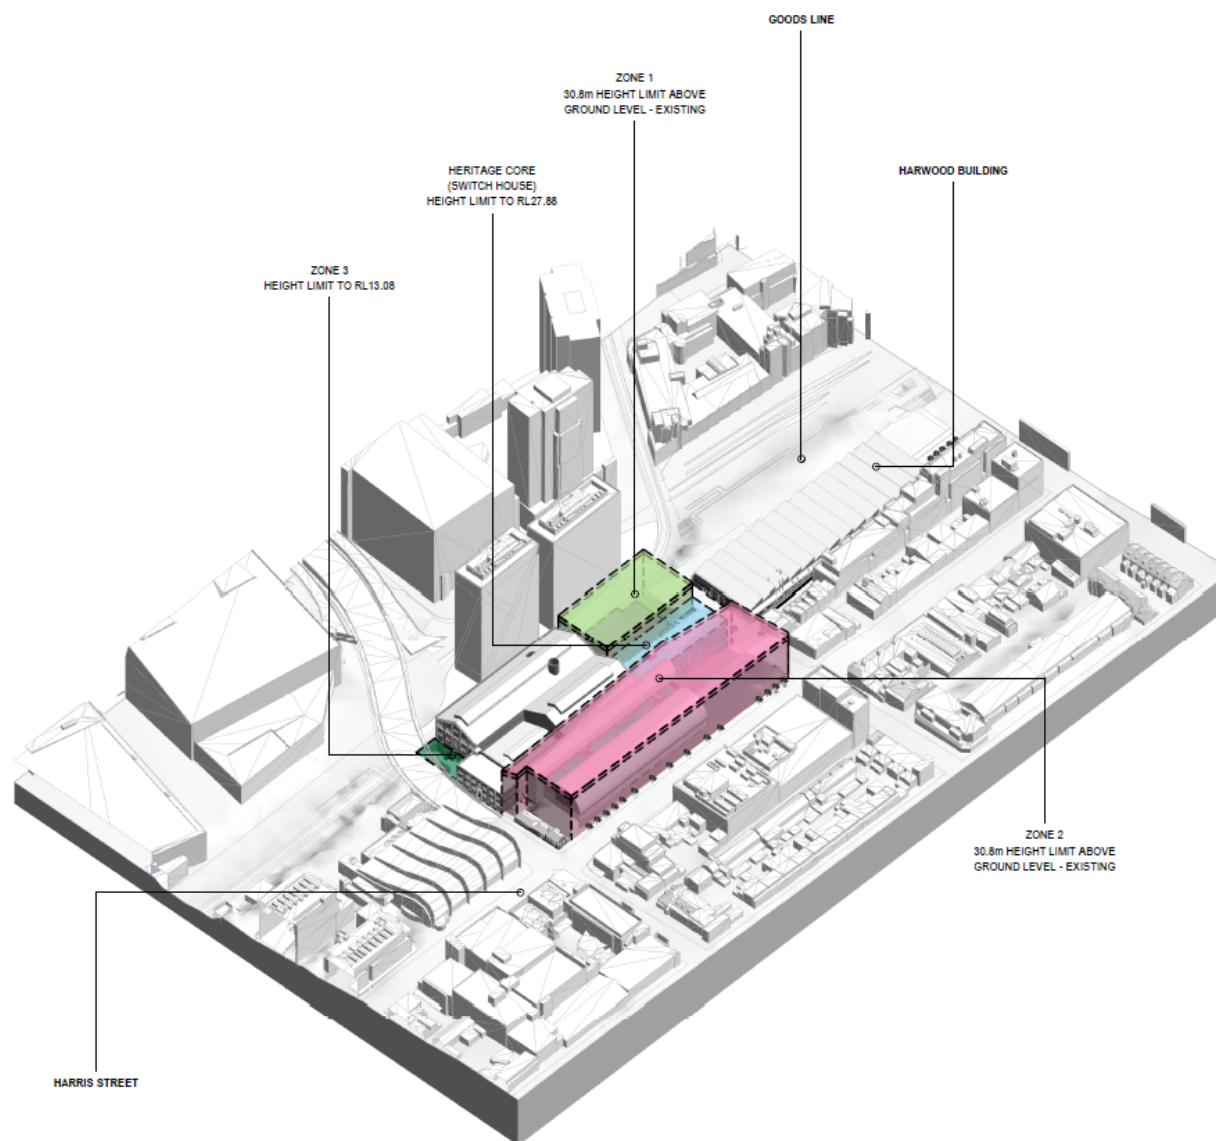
Ultimo Powerhouse- Building Envelope from the NW corner 3D Views (Source: John Wardle Architects, Feb 2022)
